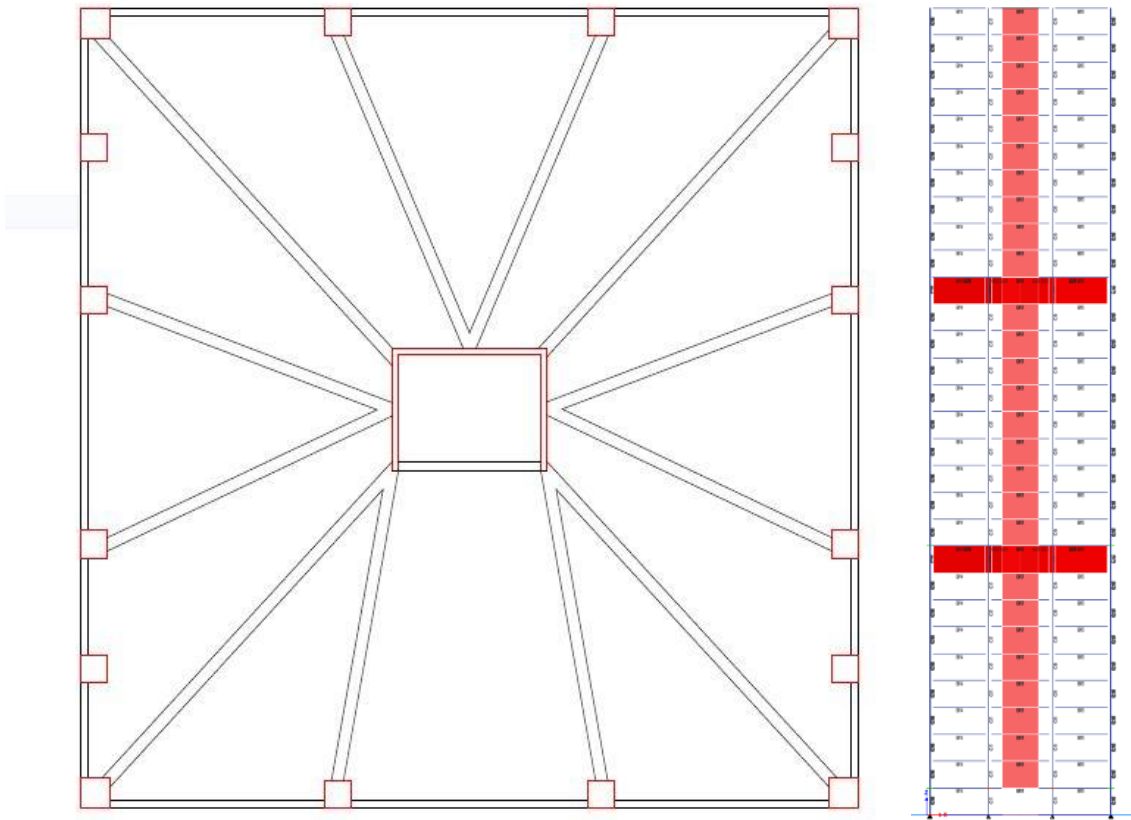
Plan&Vertical Configurations Of Outrigger Of Square Plan Model
